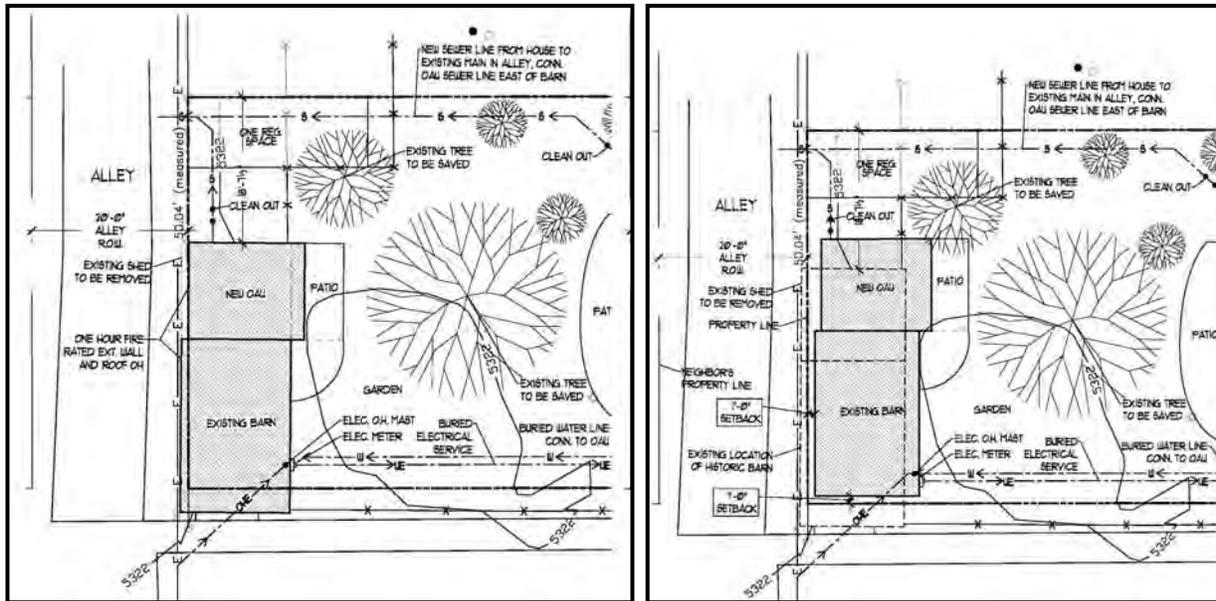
Approved (L) and proposed (R) site plans. *Not to scale.
